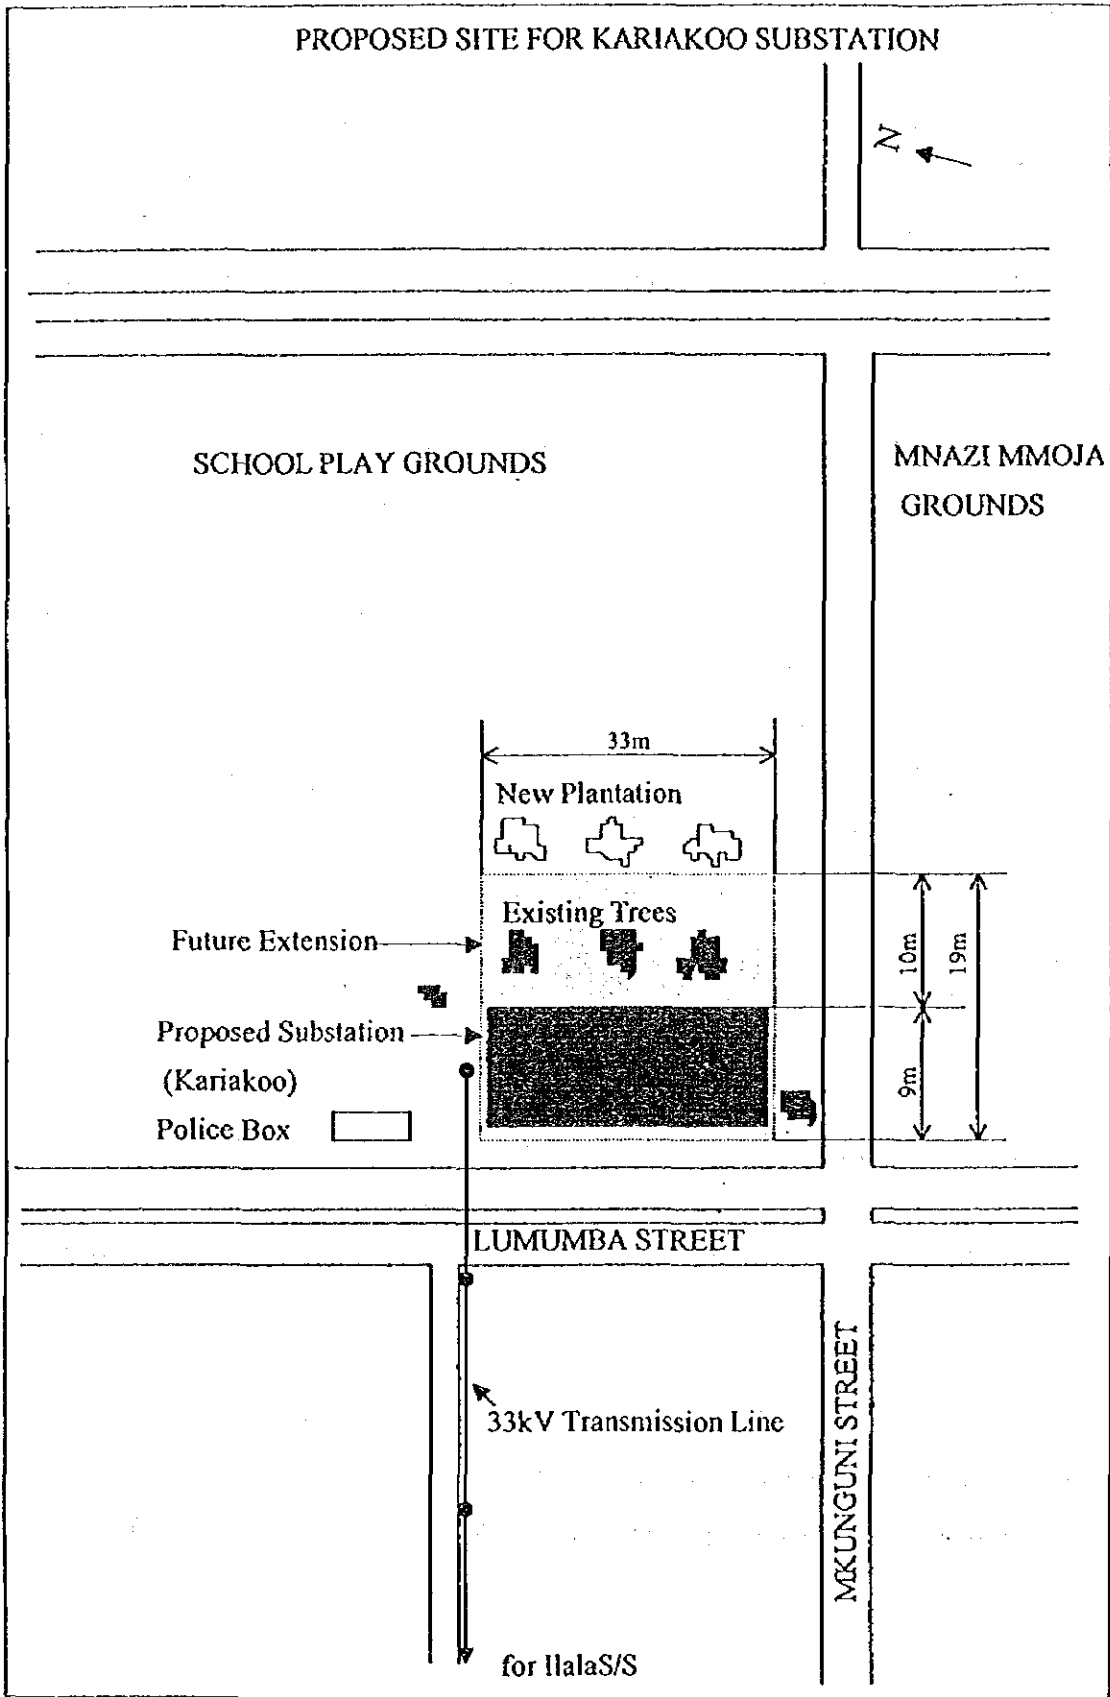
Proposed Site for Kariakoo Substation
